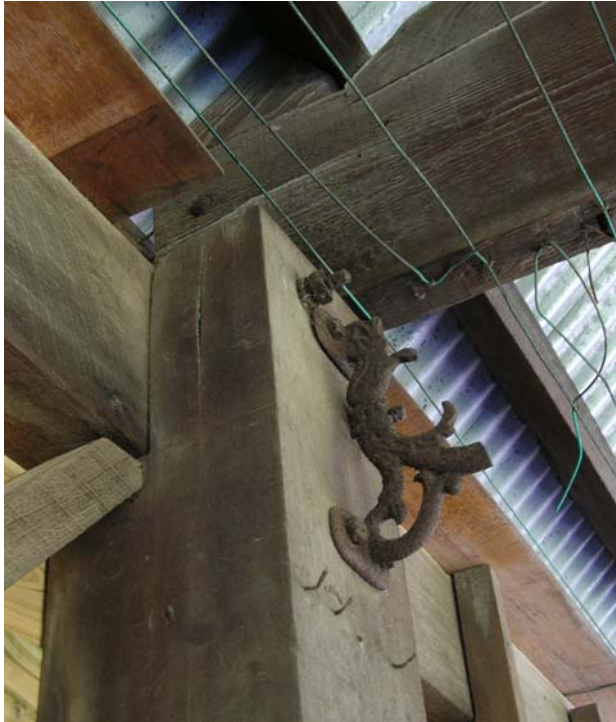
View of the pavilion. The timber roof, columns and wall structures are in relatively good condition and wearing well. Plywood lining (unpainted) on the internal face of the west wall was put in place during a recent repair and conservation campaign. The lining was subsequently painted to match existing timber structure. *Hocking Planning and Architecture, August 2009.
